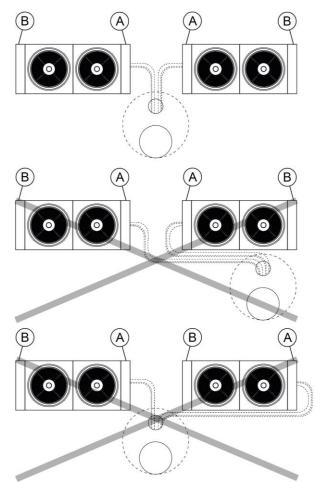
Symmetrical arrangement of buried connection pipework with the installation shaft with AIR 80 C22A.
